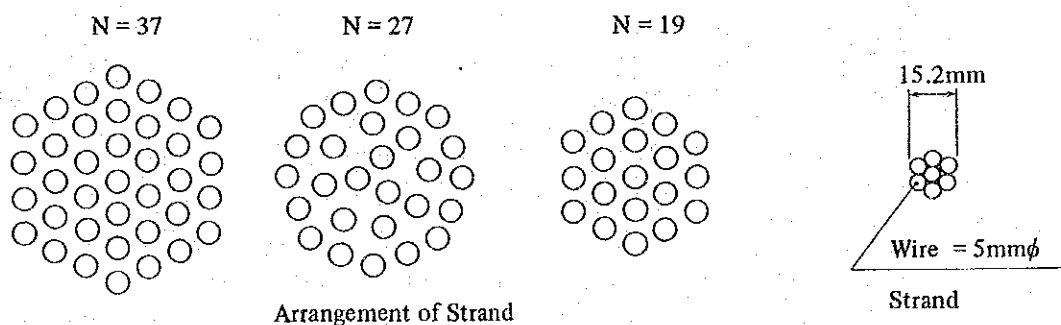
DESIGN TENSILE STRENGTH AND CROSS-SECTION OF STAYED CABLE
